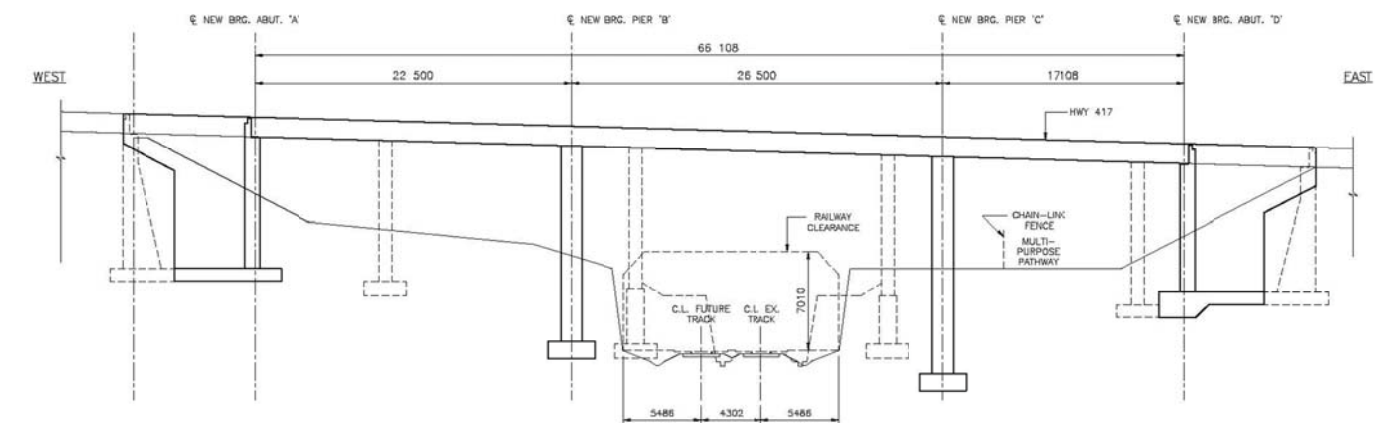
Alternative I – Three-Span Deck Structure Installed by Jack-And-Slide
